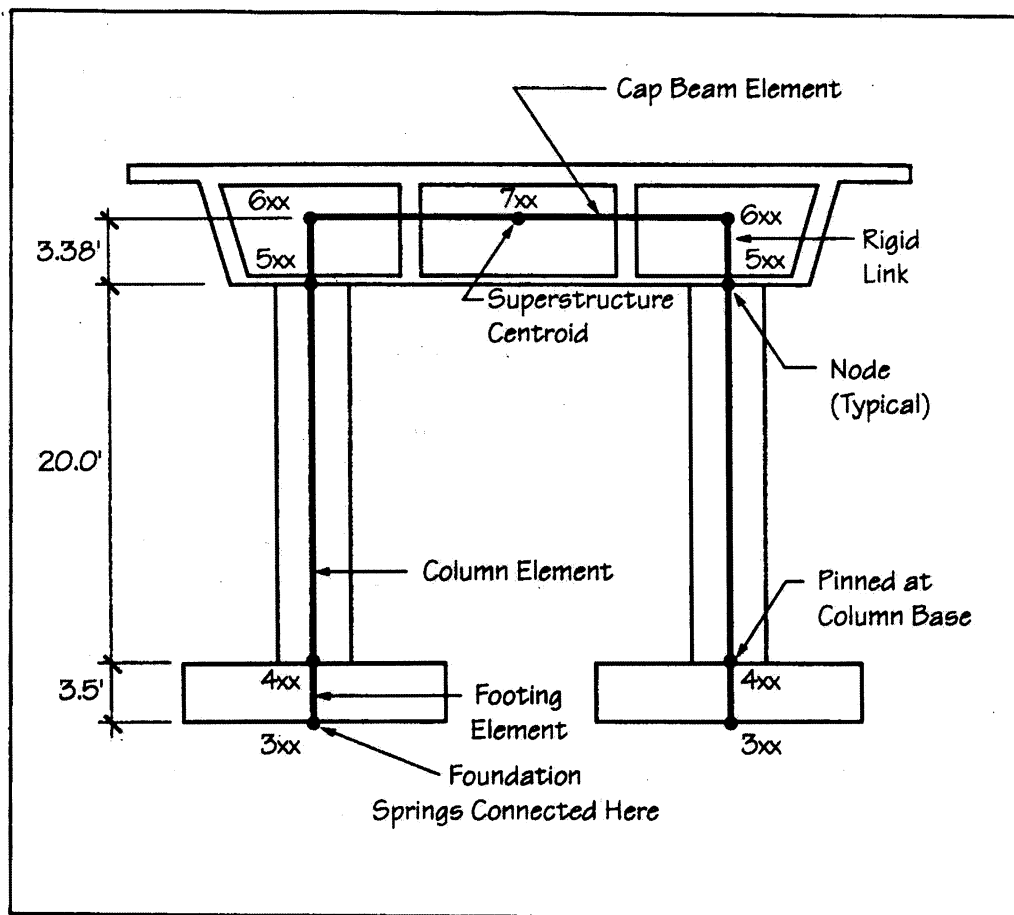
Bridge No. 4 – Details of Bent Elements
